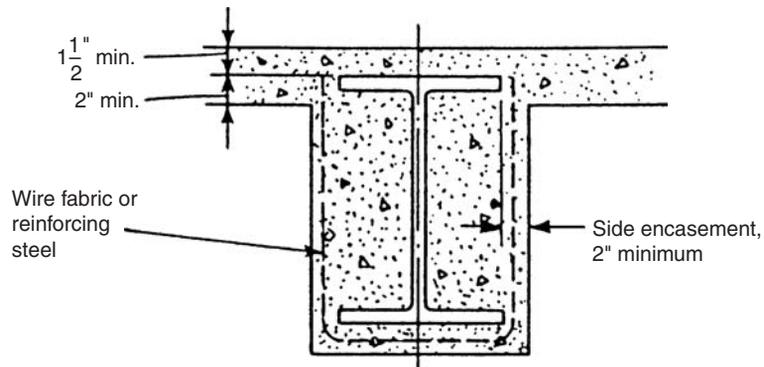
Minimum requirements for composite action with concrete-encased steel framing.
